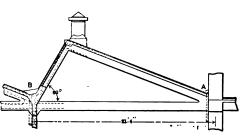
Saw-Tooth Skylight in Reinforced Concrete, with Heavy Concrete Beam as the Bottom Chord of the Truss.
